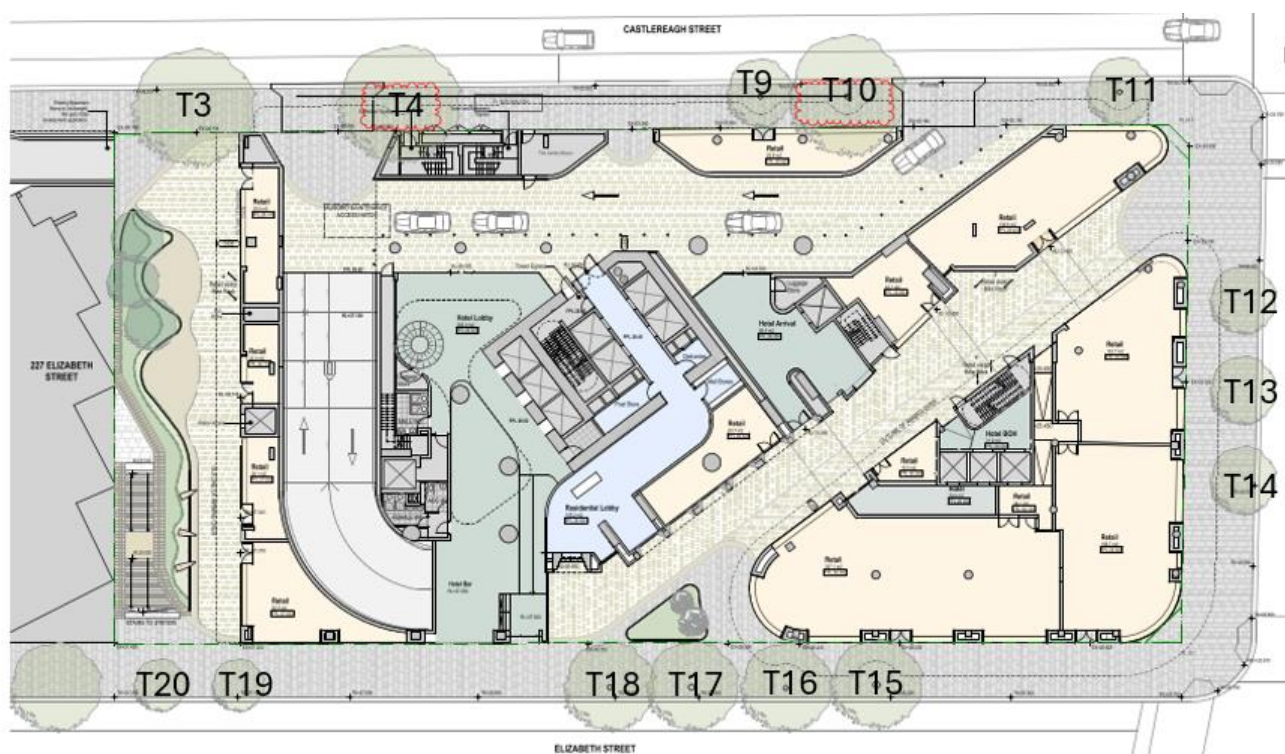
| Proposed ground floor plan, depicting location of street trees surrounding the subject site (Source: Ethos Urban RtS amended architectural drawings)
